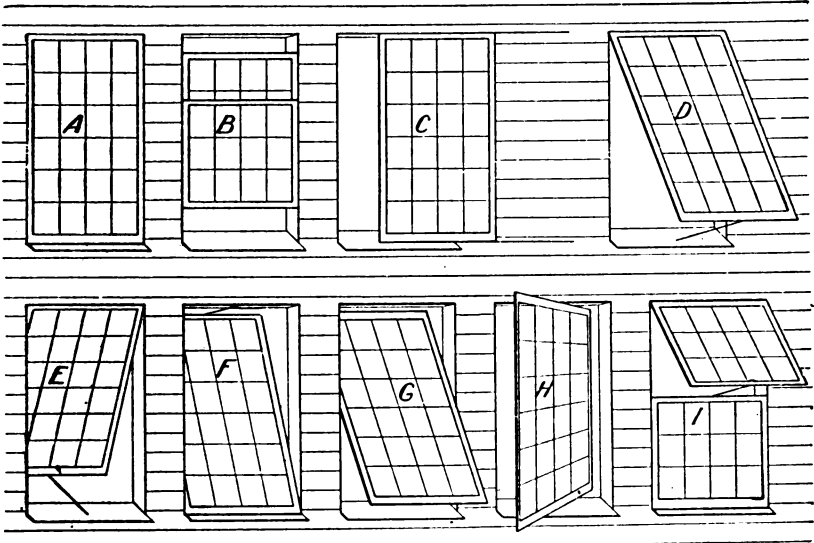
Courtesy of Cornell University. Showing plans for hinging and swinging windows.
